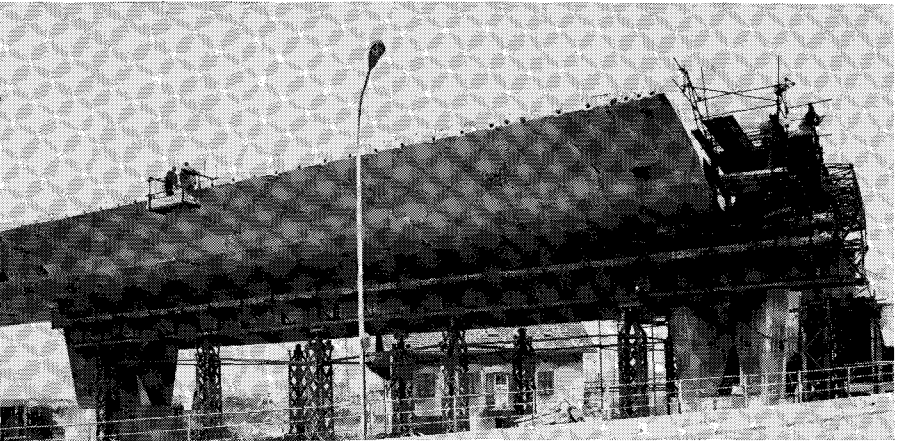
Tendons being threaded through ducts left in precast elements so falsework can be reused.
